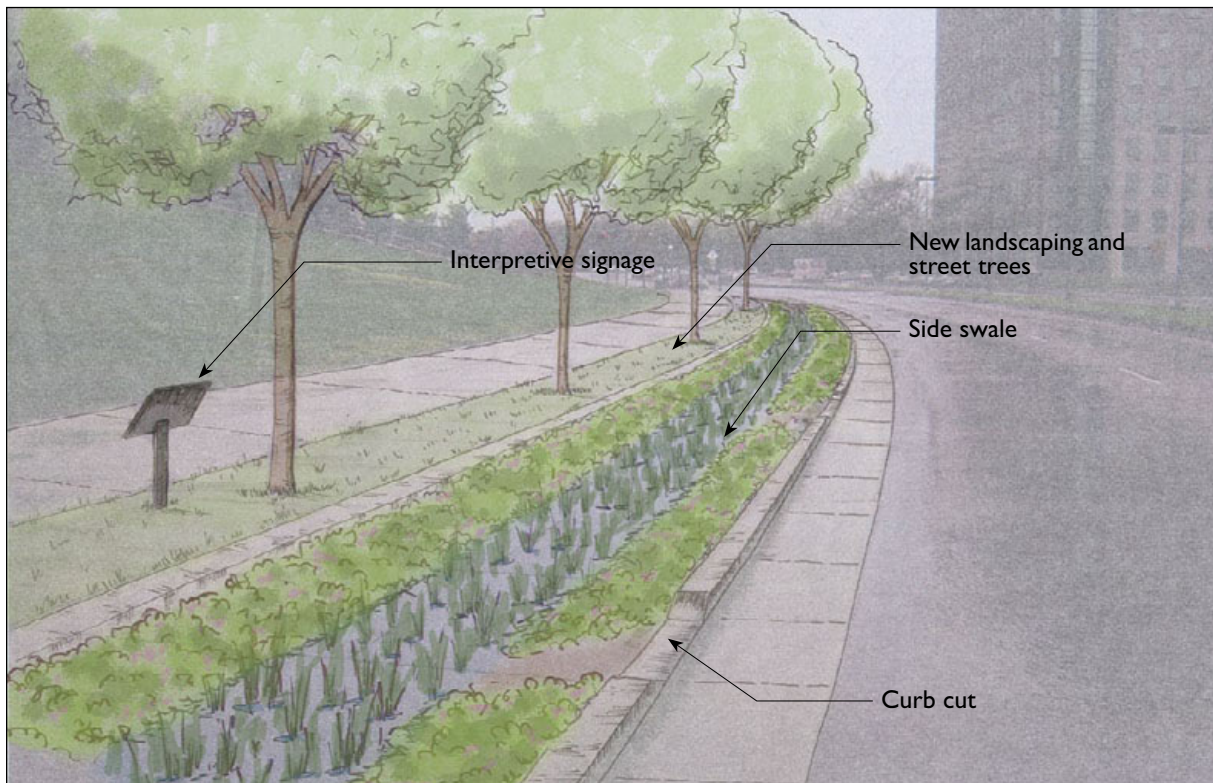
Retrofit potential:* Consolidating sidewalk space allows for a stormwater swale and street trees along this boulevard.
